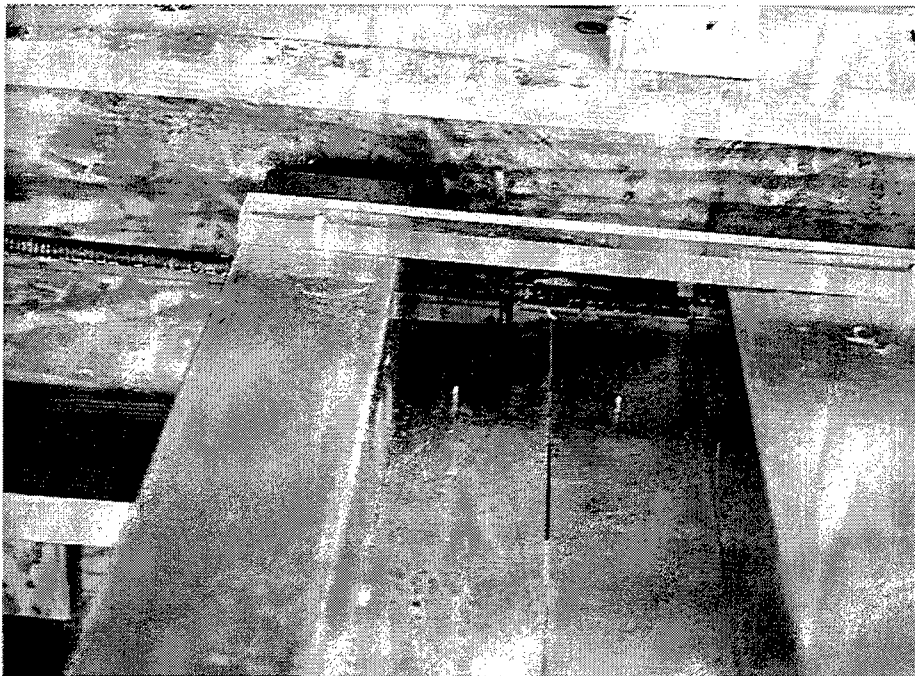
Lower reinforcing rod centered in the formwork for the footing
